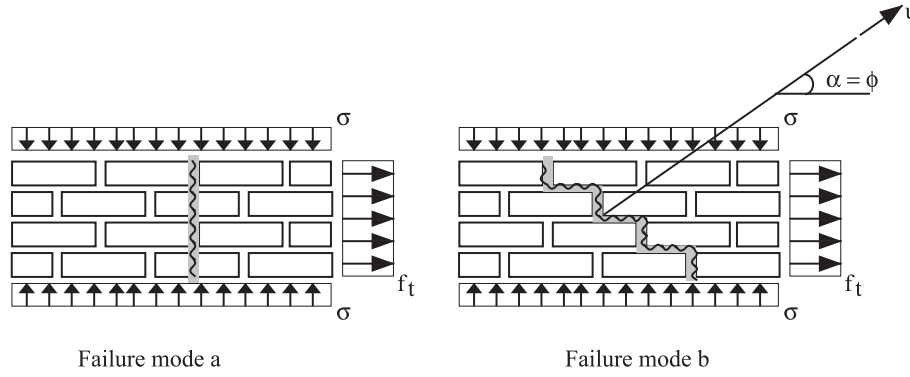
Failure modes determining the tensile strength of a masonry wall parallel to the bed joint, [1]
